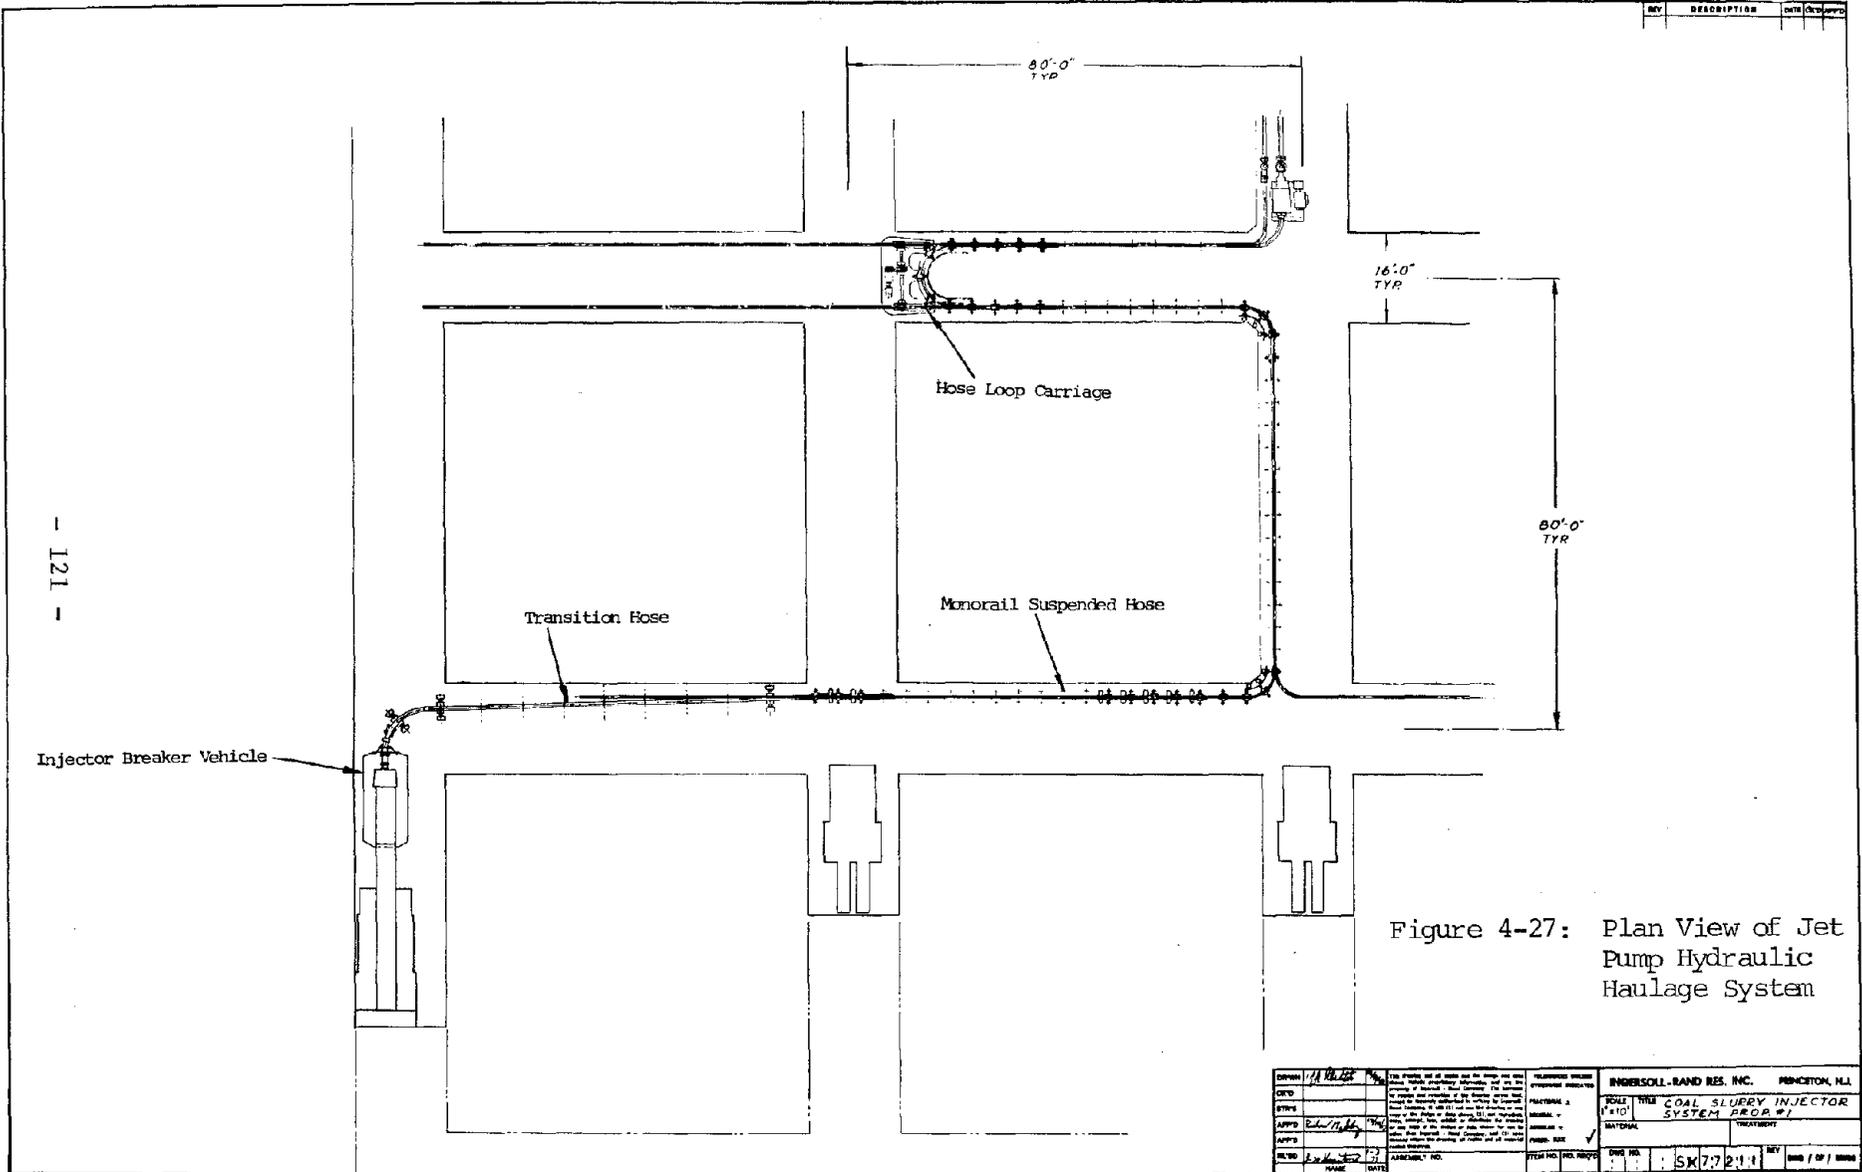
Plan View of Jet Pump Hydraulic Haulage System
